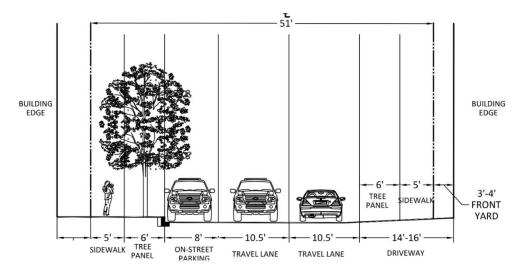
Private Street B With On-Street Parking At Front Loaded Townhouses Cross-Section
